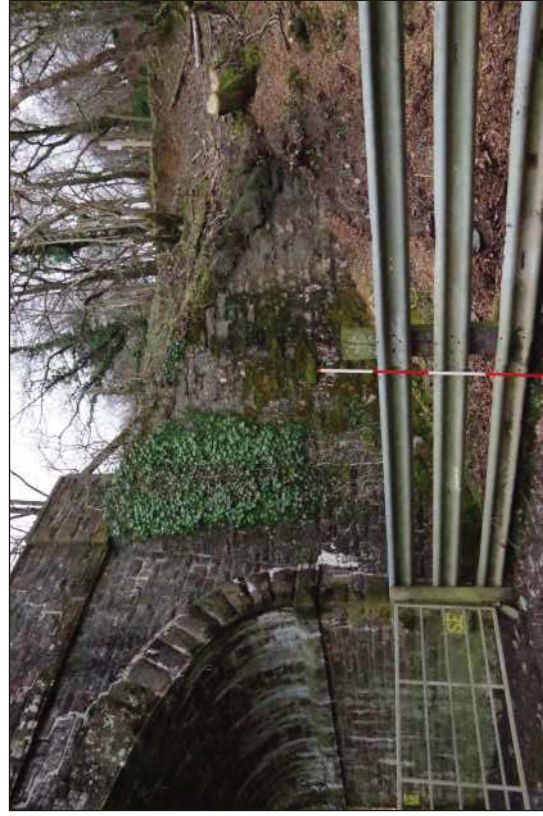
The southeast abutment, viewed from the southwest. 2m scale.
